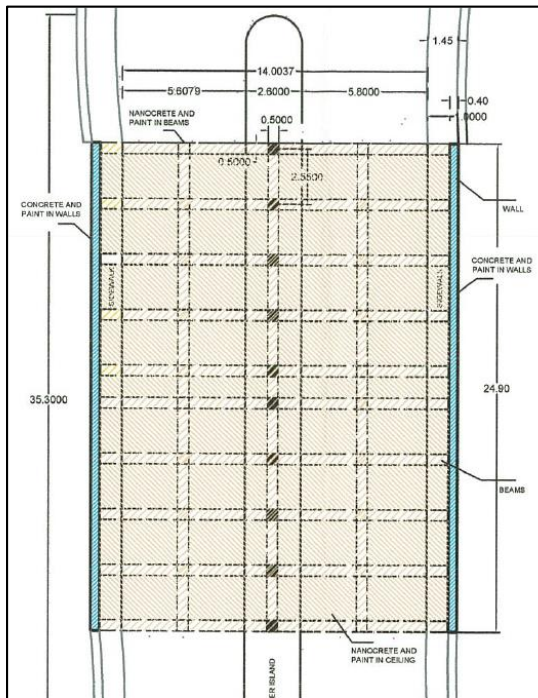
Layout of elements that have to be repaired with chosen repair materials
